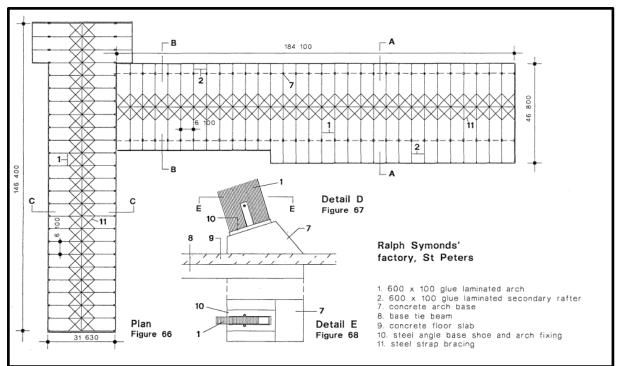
Plan of building 1994. Shows full extent of Holland Street arm (horizontal), which has since been shortened. (Source: Nolan, 1994).
